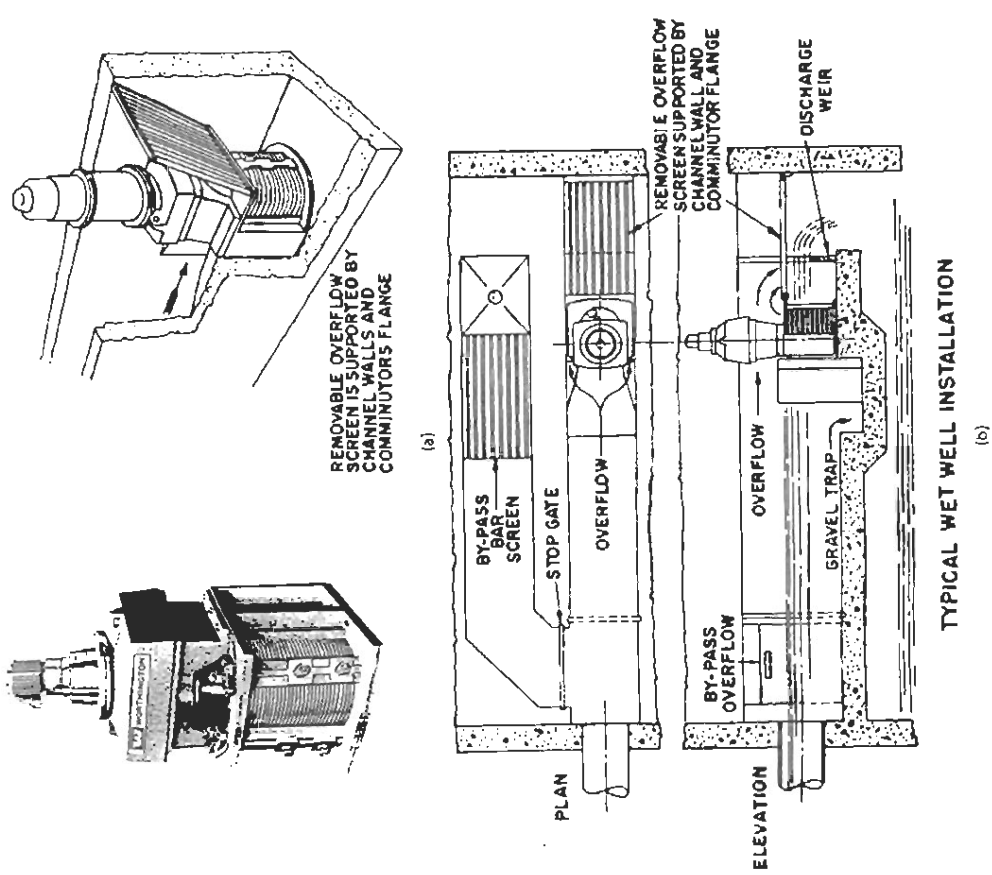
Details of Comminutor. (a) Comminutor assembly. (b) Typical wet well installation. (Courtesy Worthington Pump Corporation.)
